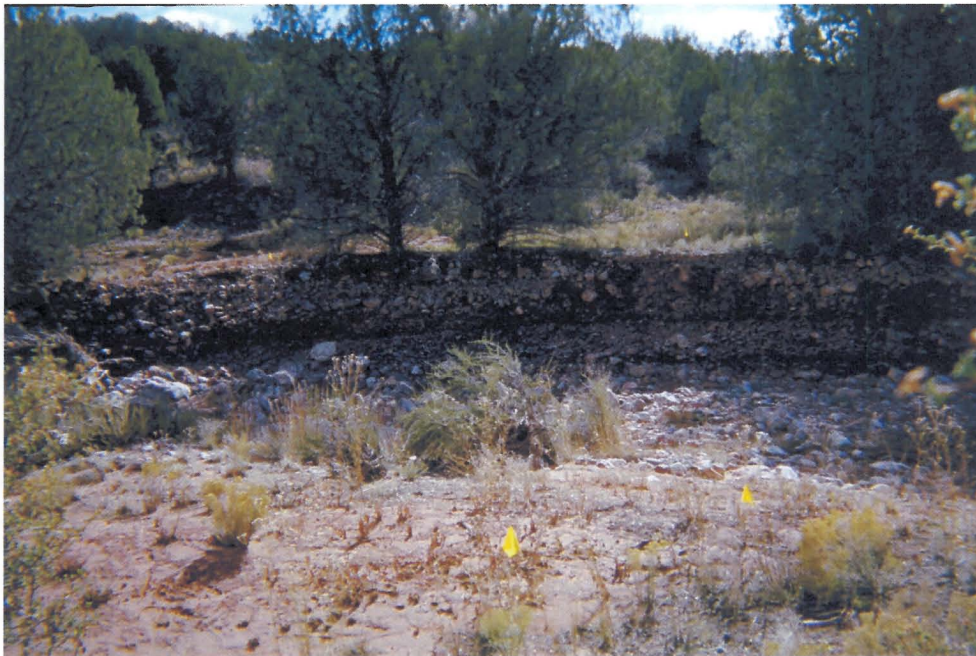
Limestone Canyon road crossing between the quarry and the quarry facility area (in background). The yellow flagging indicates roads alignment. View to the south.
